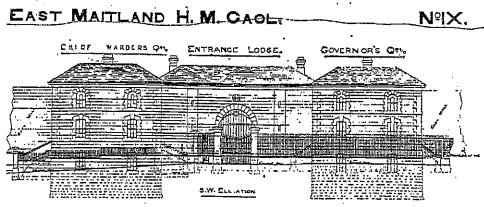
South-west elevation showing gatehouse group. (DPW&S Pian Room PC 321/6).
